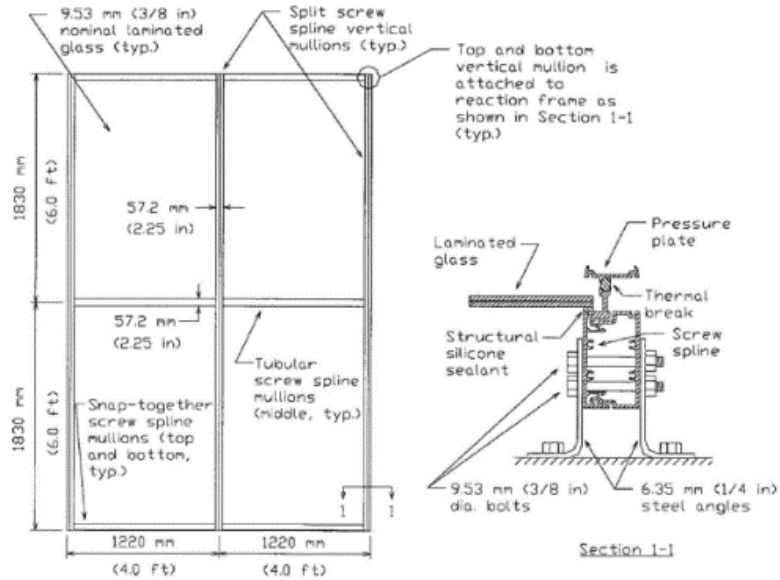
Split screw spline curtain wall specimen (Elevation and Section) (Weggel et al., 2007)
